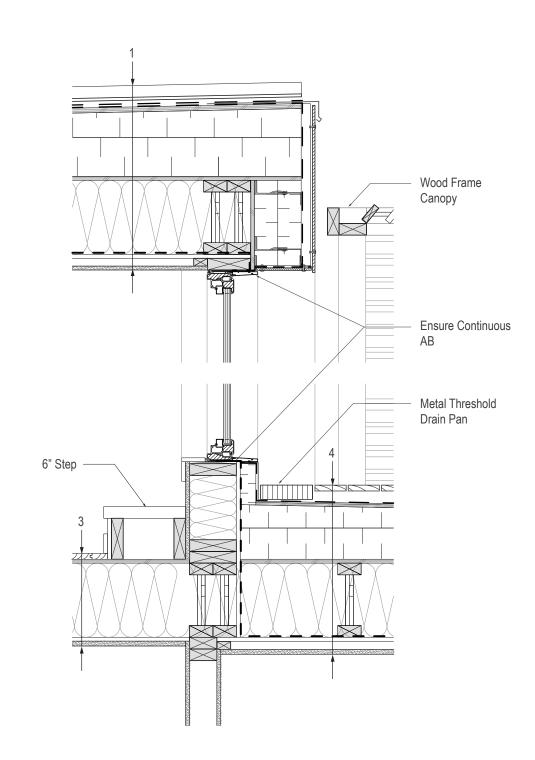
North Aperture Sill & Top Plate Scale: 1" = 1'-0"
